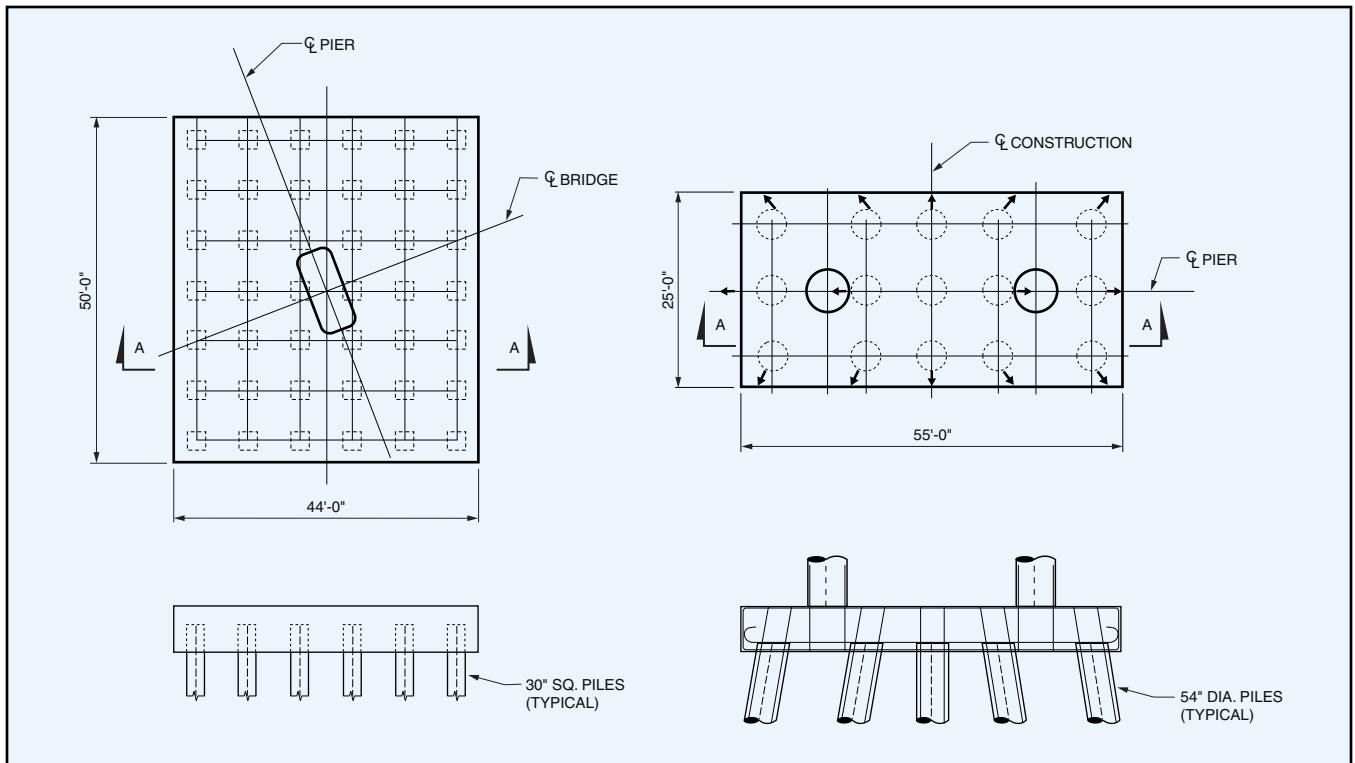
Comparison between footings using 30 in. (760 mm) square and 54 in. (1370 mm) diameter precast, prestressed concrete piles.
